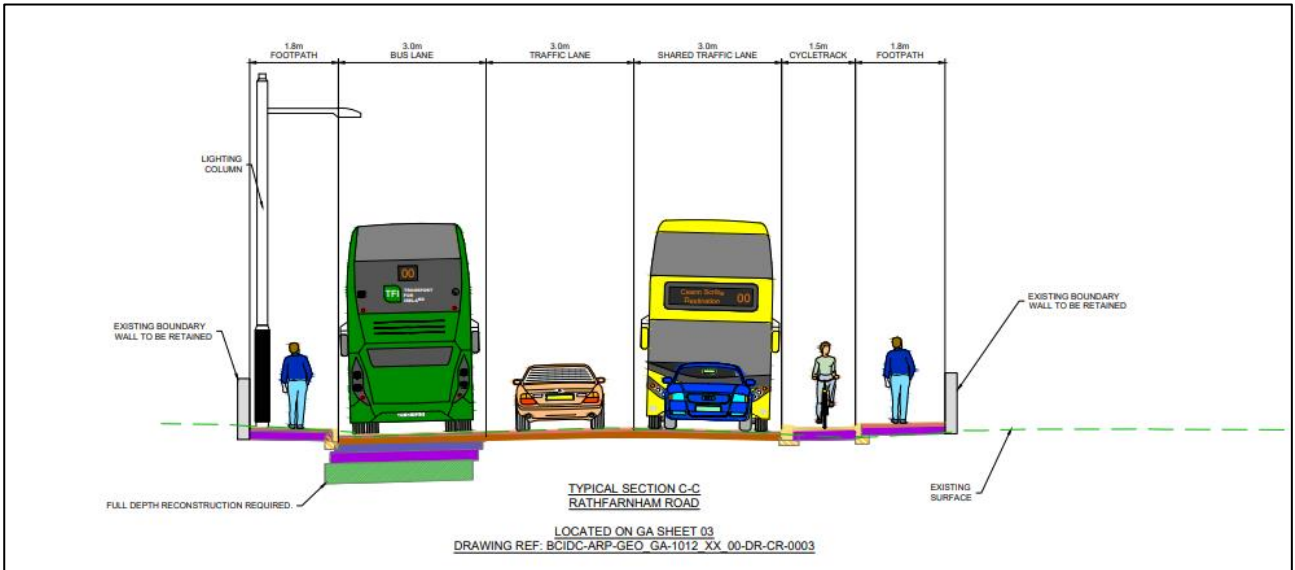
Typical Cross-Section adjacent to Village Green
